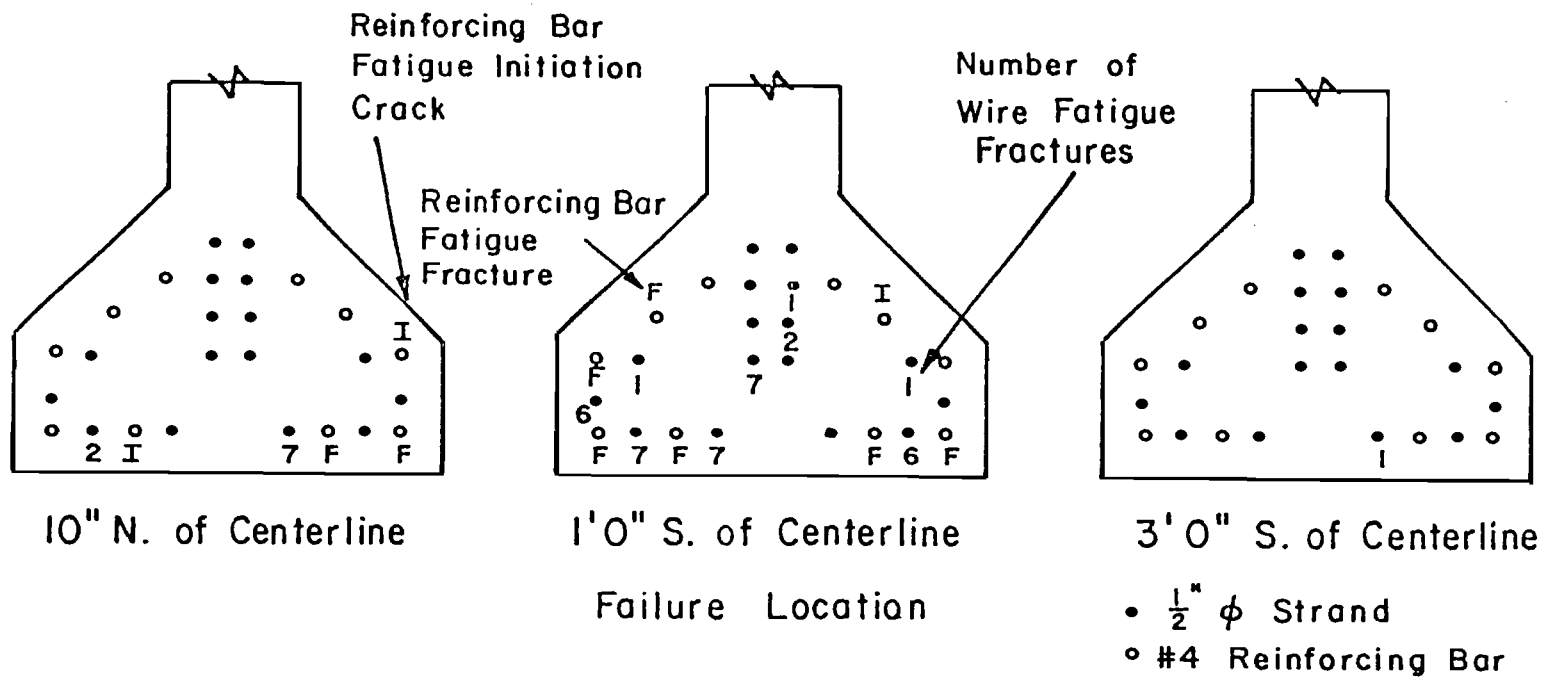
Location of fatigue fractures and initiation cracks for Specimen C-16-CP-5.5-OL-9.43
